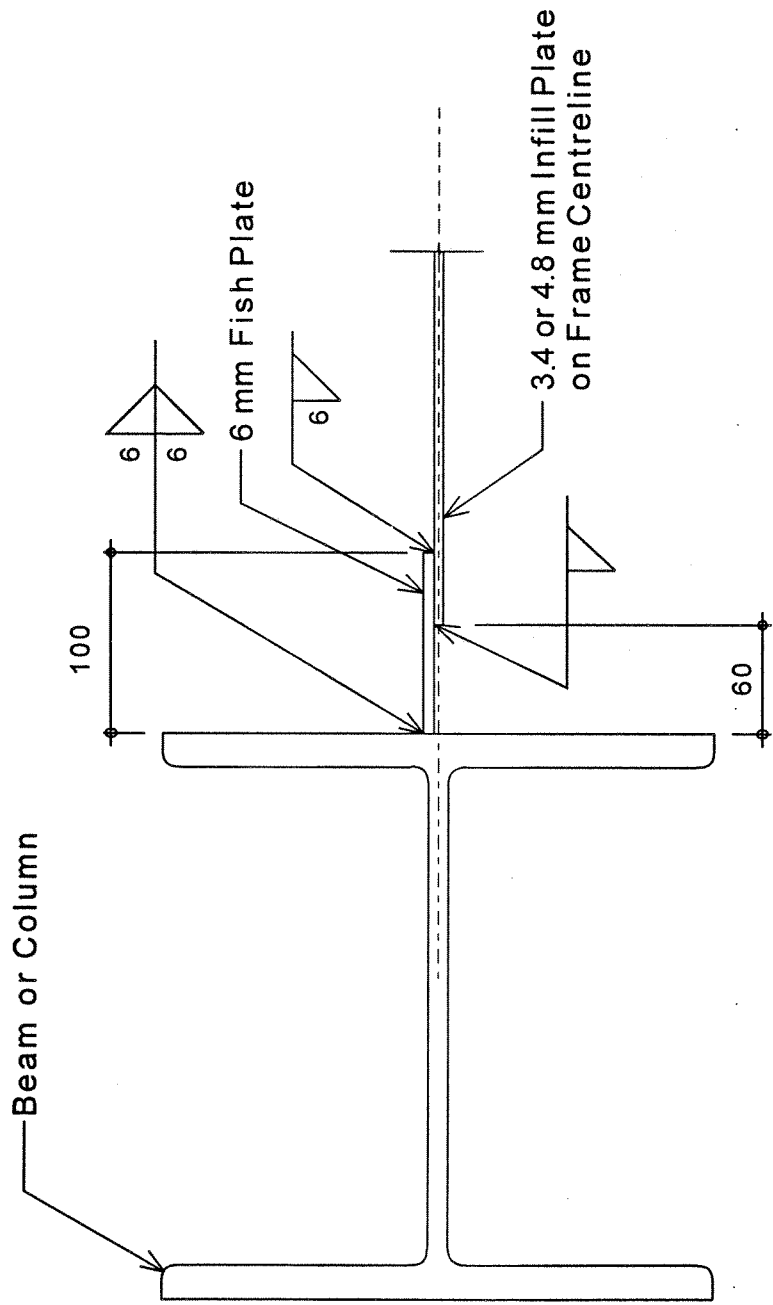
Fish Plate Detail Used in Test Specimen
